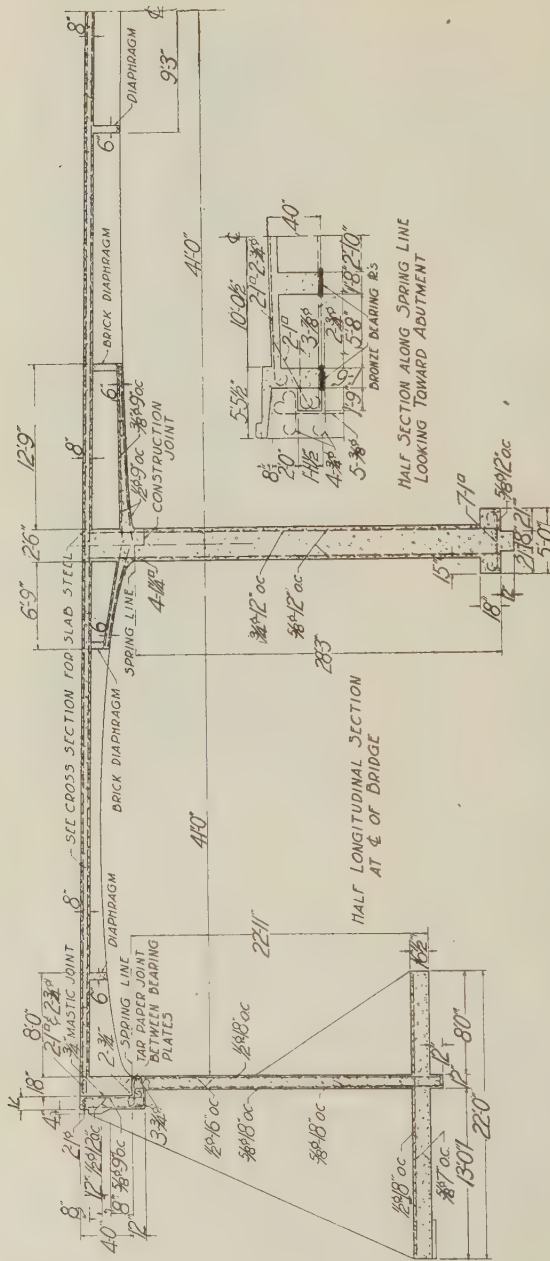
DETAILS, GARDEN STREET BRIDGE OVER COMAL RIVER,
